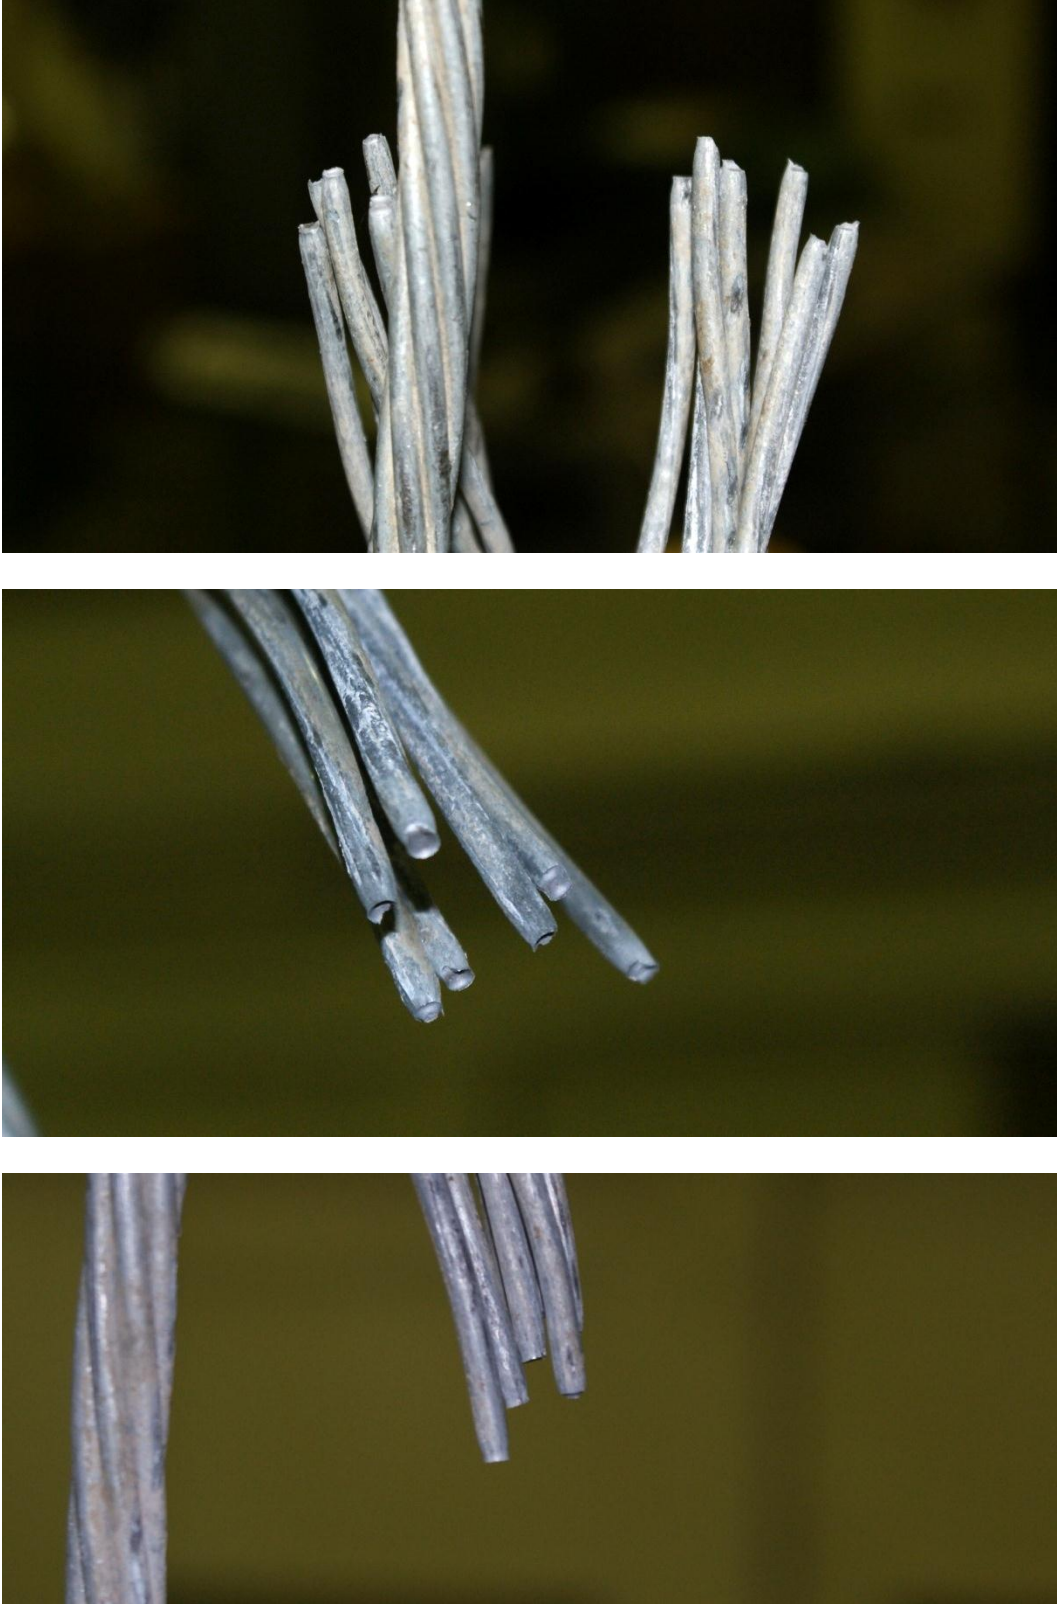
Ductile Fracture Surfaces with Necking, Prestretched Wire Rope
